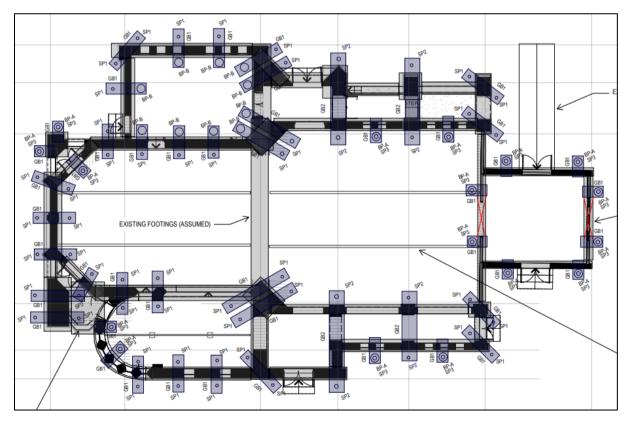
Foundation Plan showing piers (circles) and ground beams (rectangles) to support existing footings. (Source BT)
